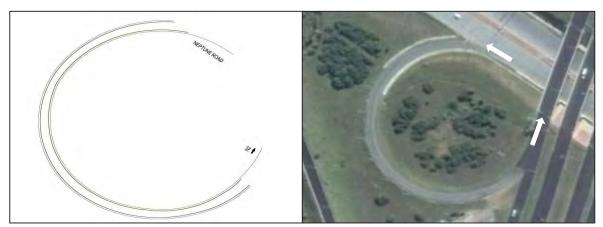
Geometric layout and aerial view of the Neptune Road/ N2 merge
